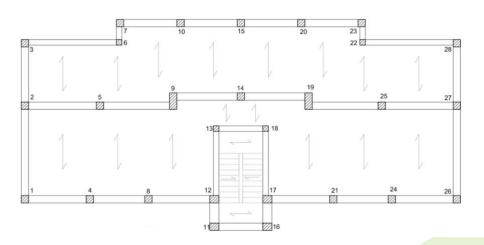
Beams, columns and arrangement of unidirectional slabs.
